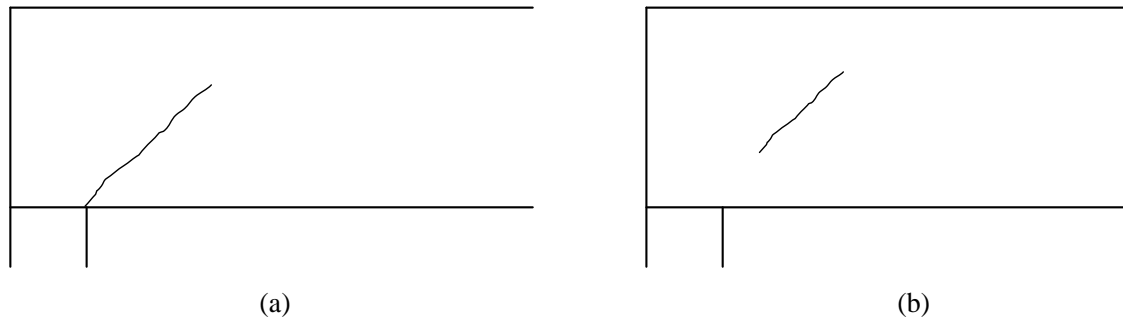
Different shear cracks: (a) Flexural shear crack and (b) Web shear crack.
